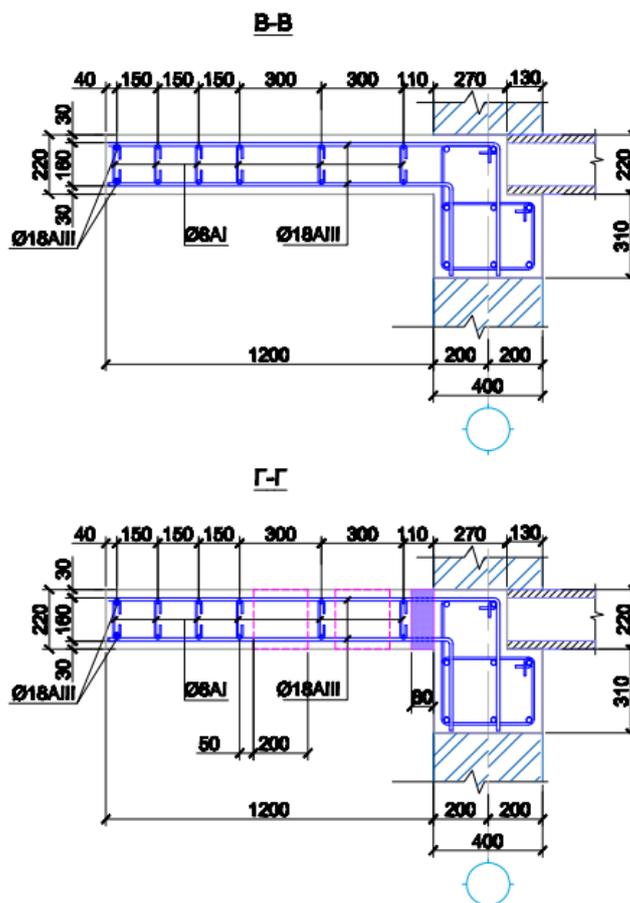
Location of the insulation in the assembly, structural solution of the balcony slab's support, and its reinforcement.
